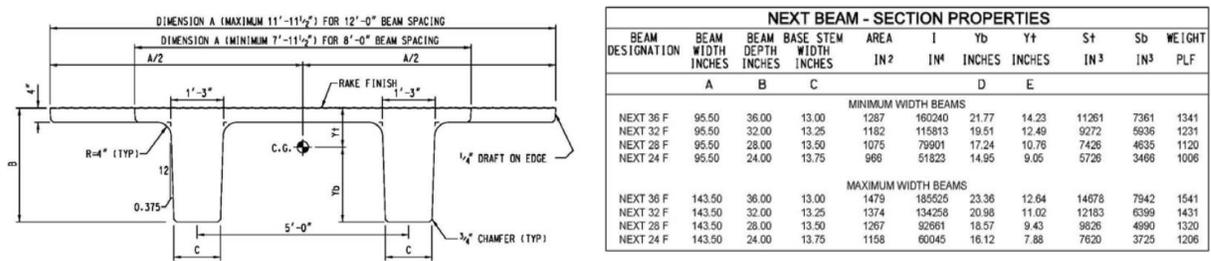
Section Properties of NEXT Beams<sup>2,3</sup>
